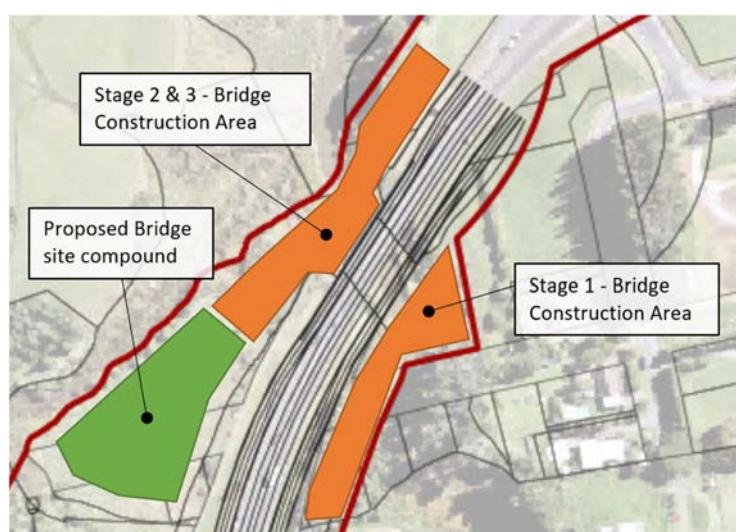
SH22 Ngakoroa Bridge Indicative works areas
